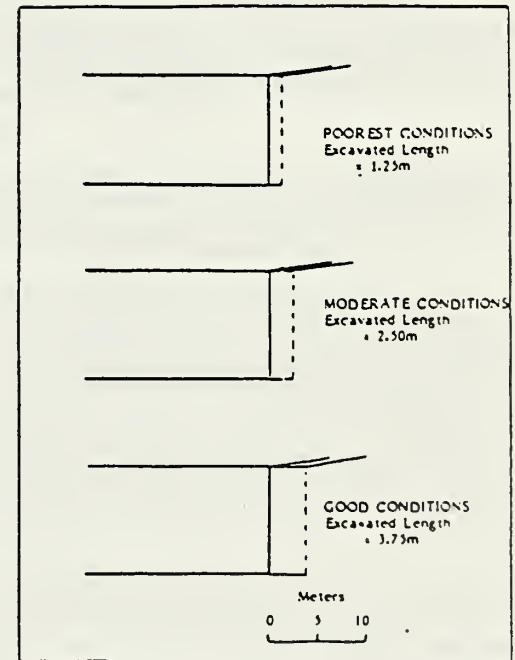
Tunnel cross section and details of in situ support (Infillaggi). Limina Motorway, Mammola, Italy.
